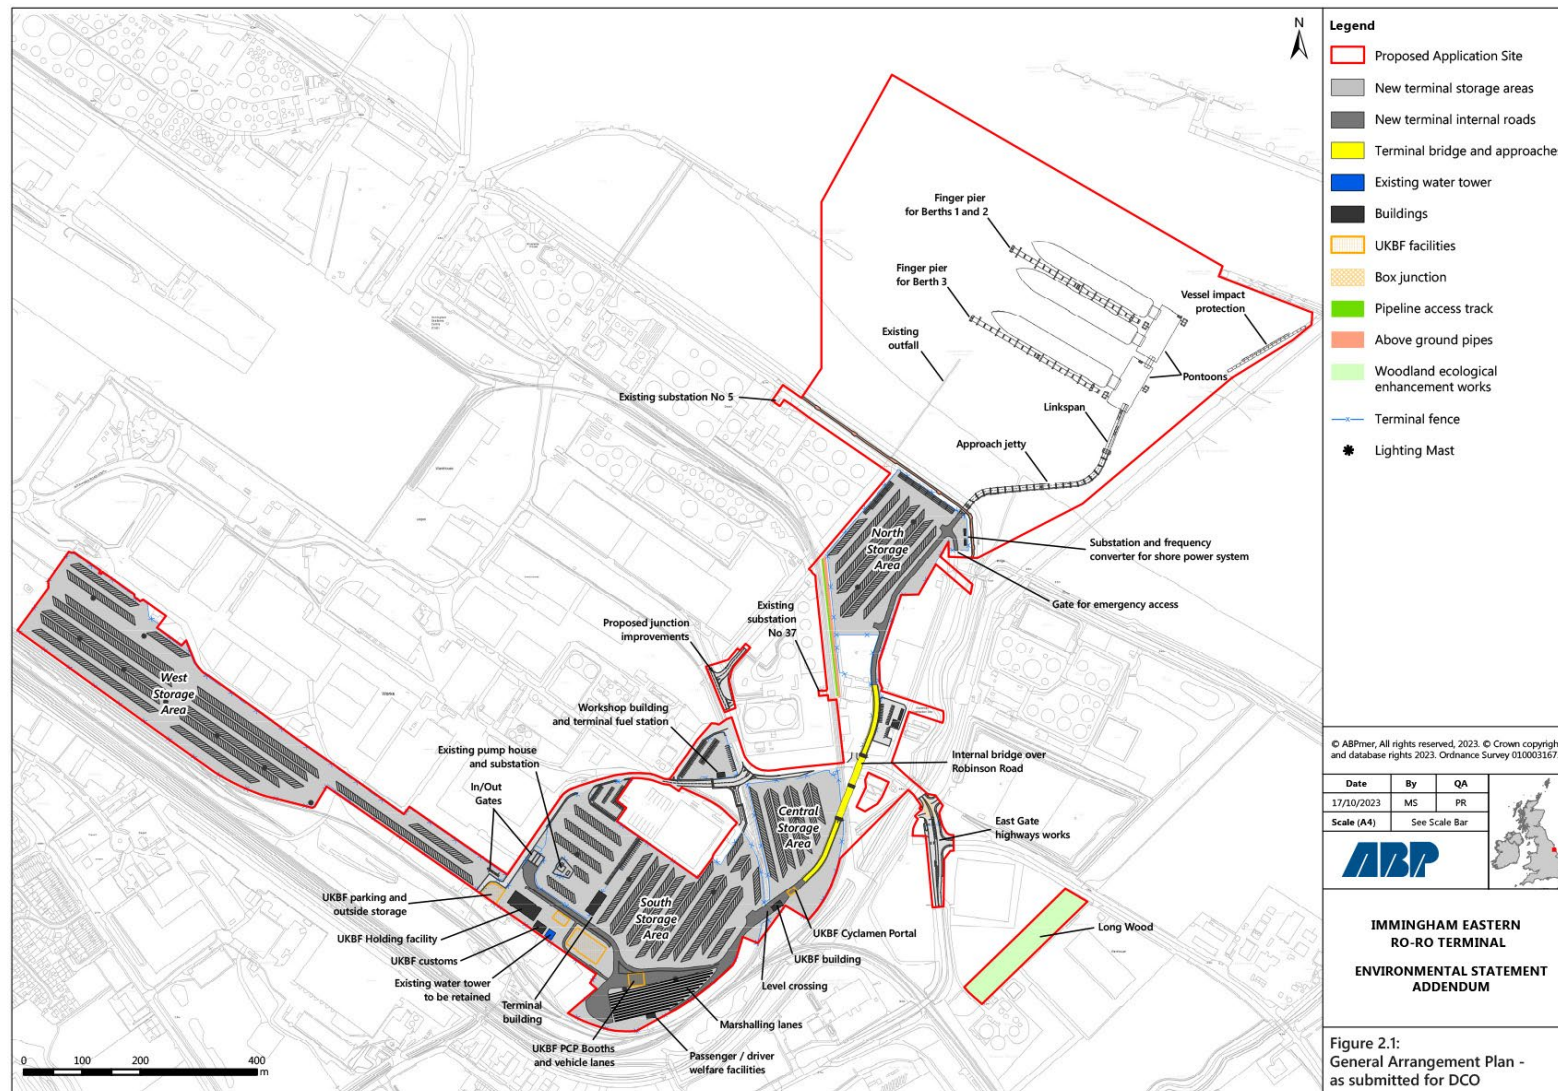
General Arrangement Plan as submitted for the DCO application
